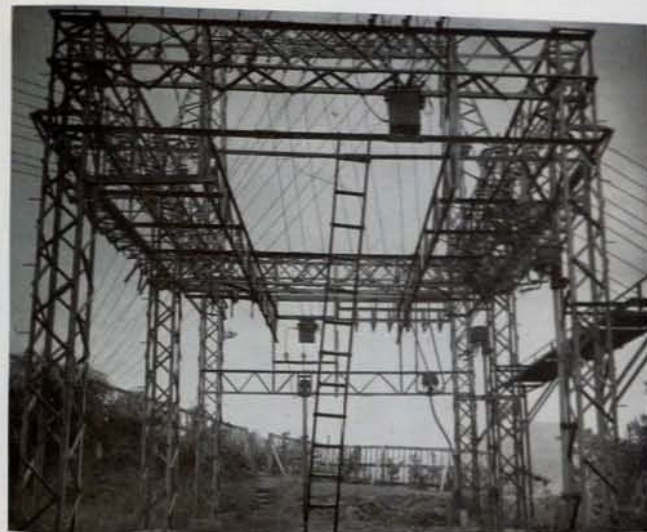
10,500 feet from GZ. 3.5-kilovolt switch rack, Akunoura Substation.
